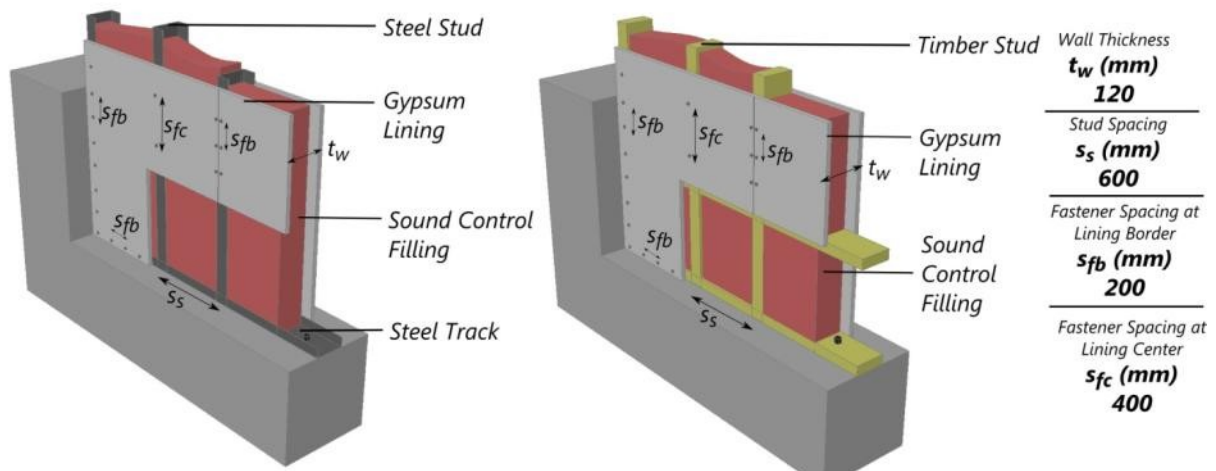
Light gauge steel framed drywall (Left), Timber framed drywall (Right)
